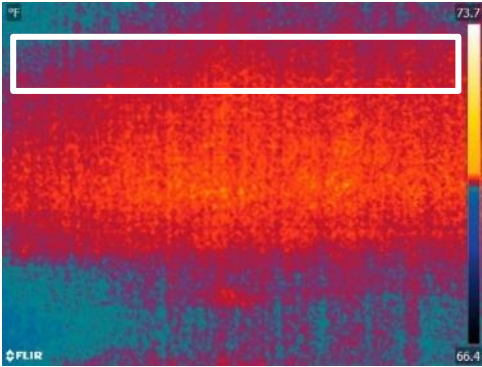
Mild Surface Defects Detected on UHPC Girders.
